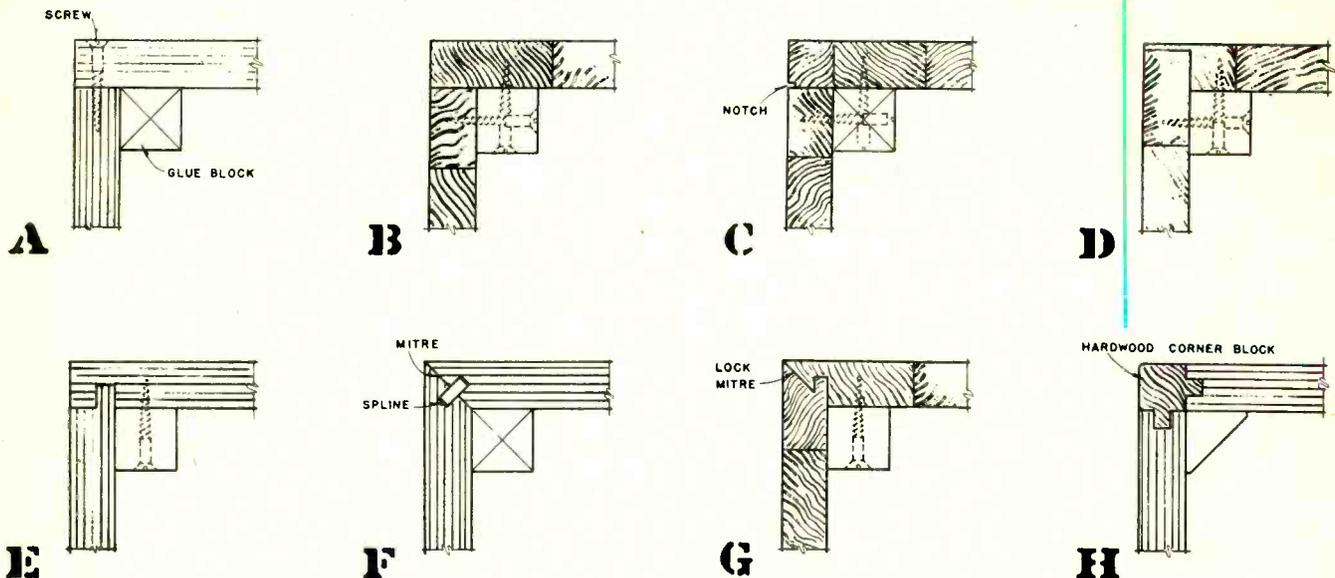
Common woodworking joints used in cabinet work. Text explains details of joints shown in parts A to H. (Drawings by J. R. Radcliffe.)
